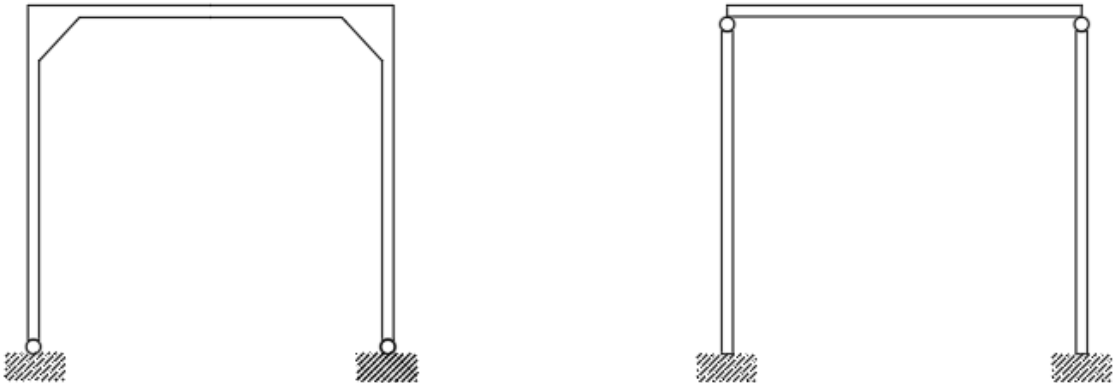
Left: Moment stiff connection between vertical and horizontal element, Right: Moment stiff connection between vertical element and foundation.
